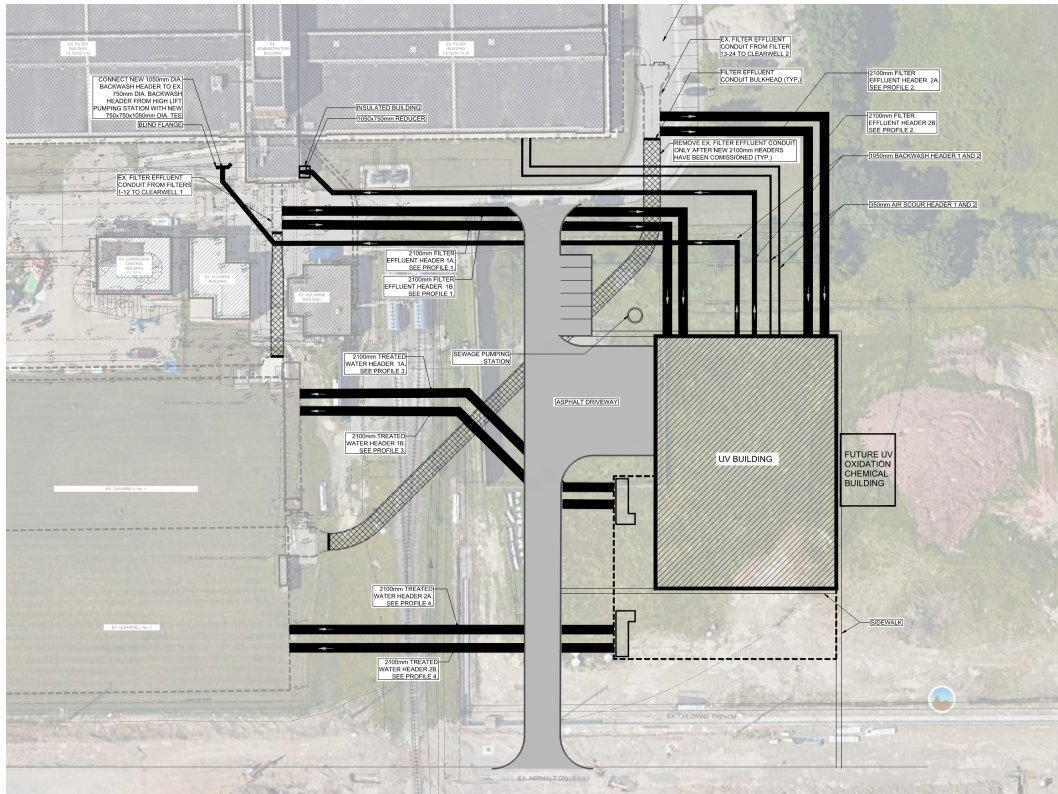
Proposed UV Building Infrastructure and Layout (Source: AECOM Conceptual Design, 2021)
